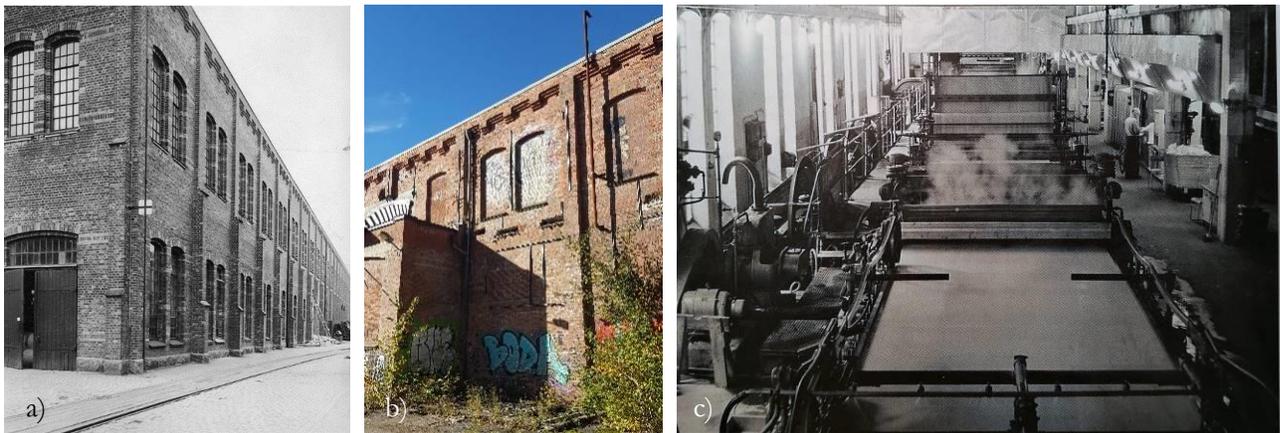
(a) The industrial building from 1896, photo from 1918, (b) The exterior of the tested external wall, (c) Interior of the building when it was in operation as a paper mill.
